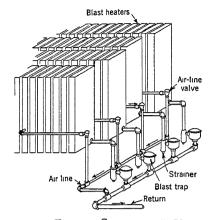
Typical Connections to Central Fan System Heating Units Exceeding 12 Sections
